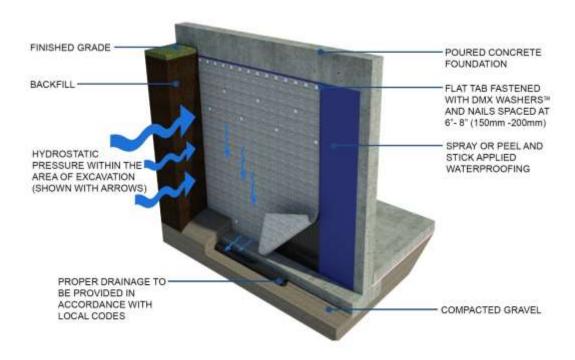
DMX Drain 5X™ on Poured Concrete Foundation
